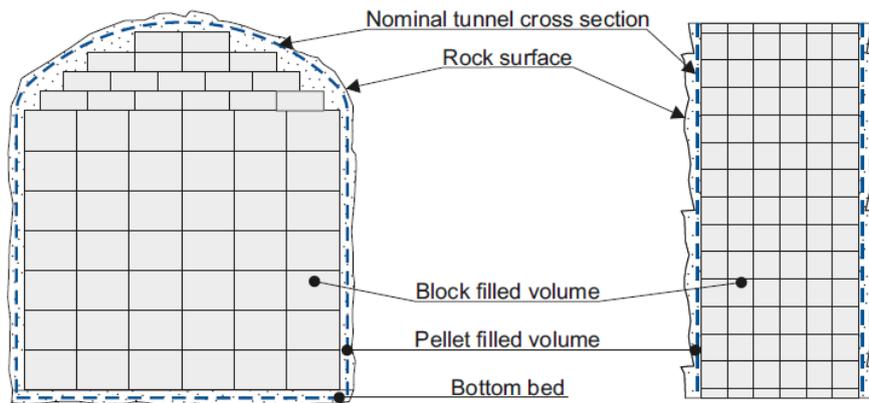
Reference geometry of the installed backfill in a schematic tunnel.
